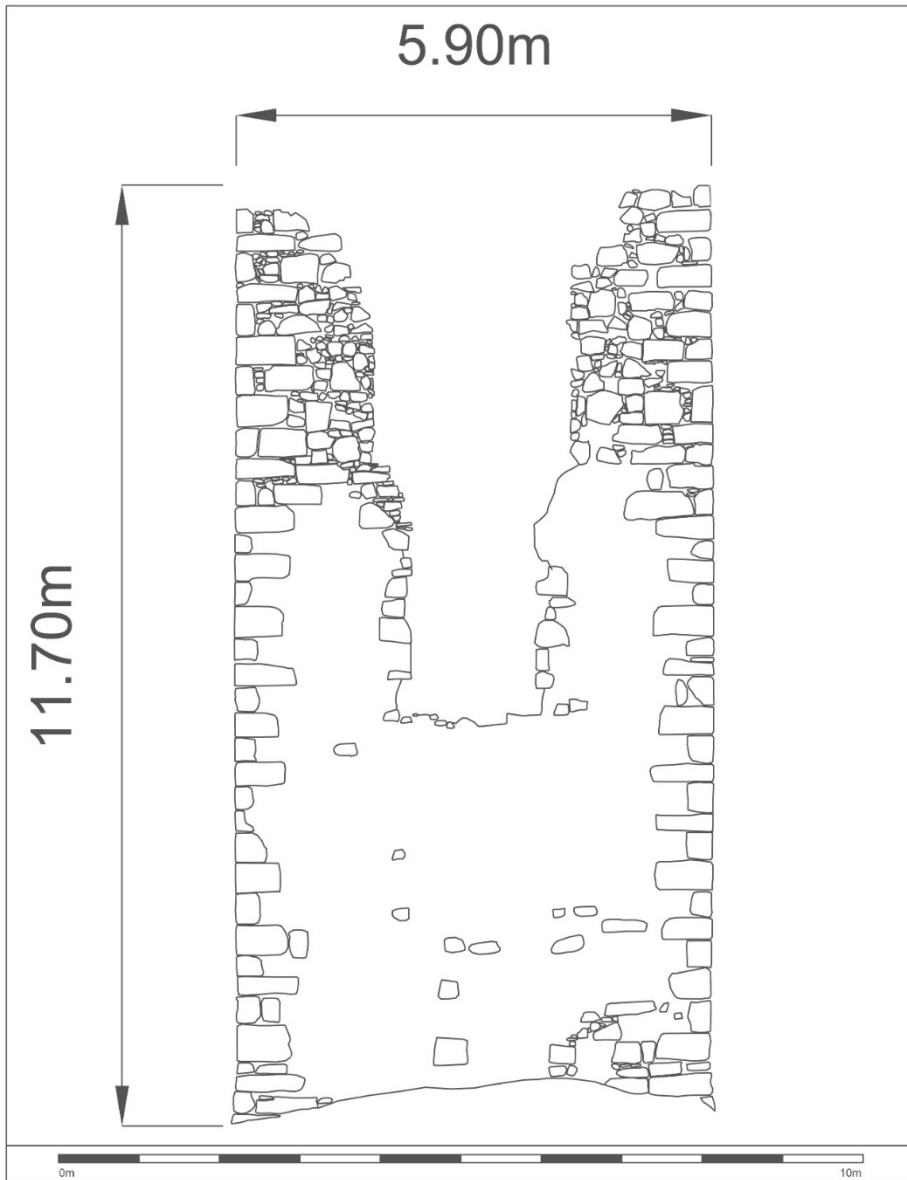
External elevation of the north-west wall of the signal tower at Mullaghderg Hill Signal Station.
